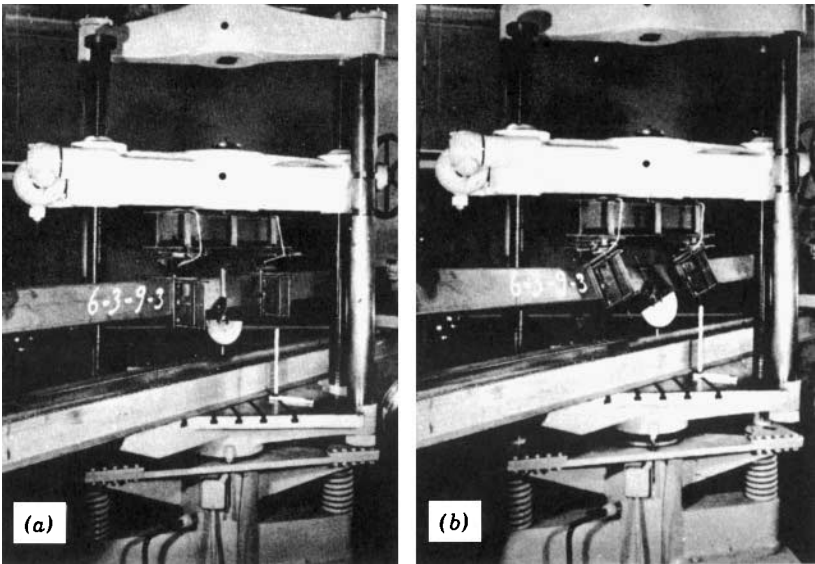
Twist of unbraced channel loaded in plane of its web.^{1,6} (a) Before loading. (b) Near maximum load.
